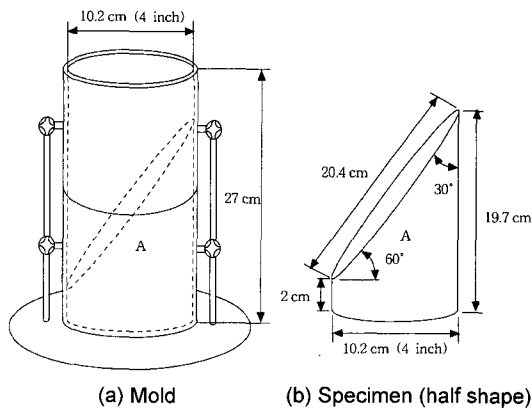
Schematics and dimensions of experimental mold and specimen shape.
